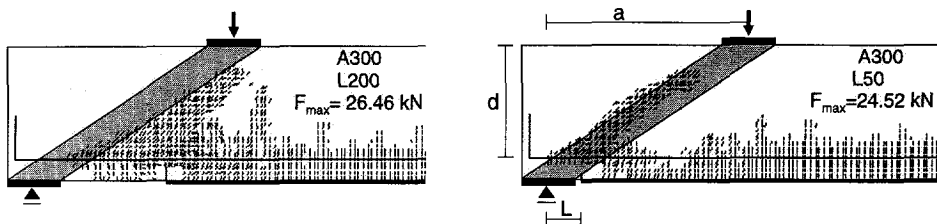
Direct concrete strut between loading point and support (L200); if plate is bonded at a short distance from the support, the strut is cut by plate-end shear crack (L50)
